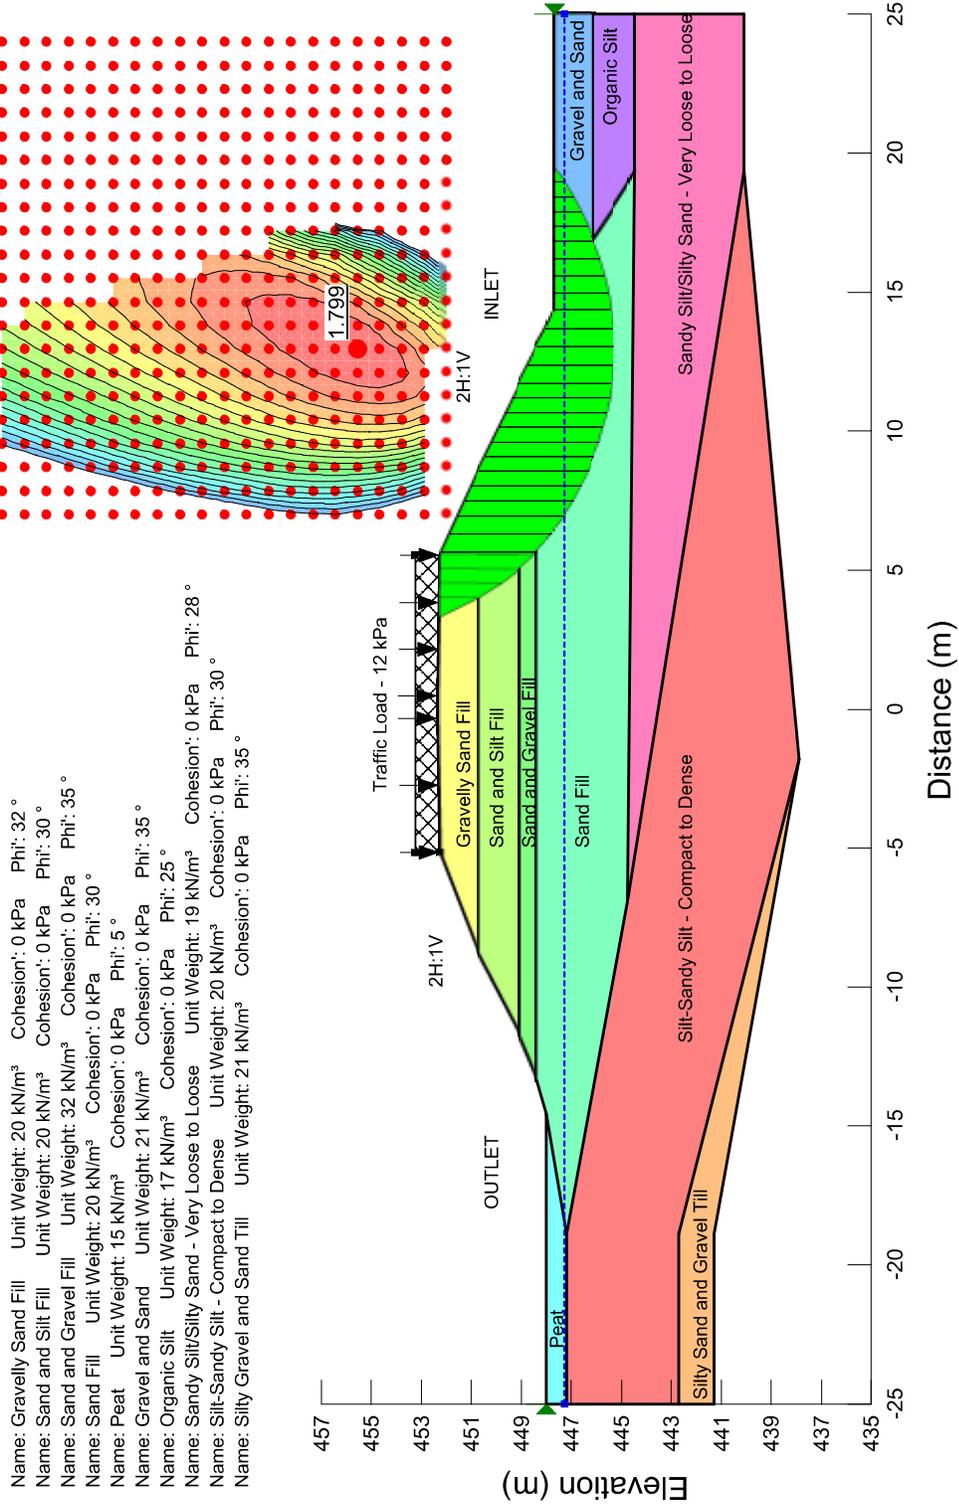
Existing Embankment Stability - Outlet Side
